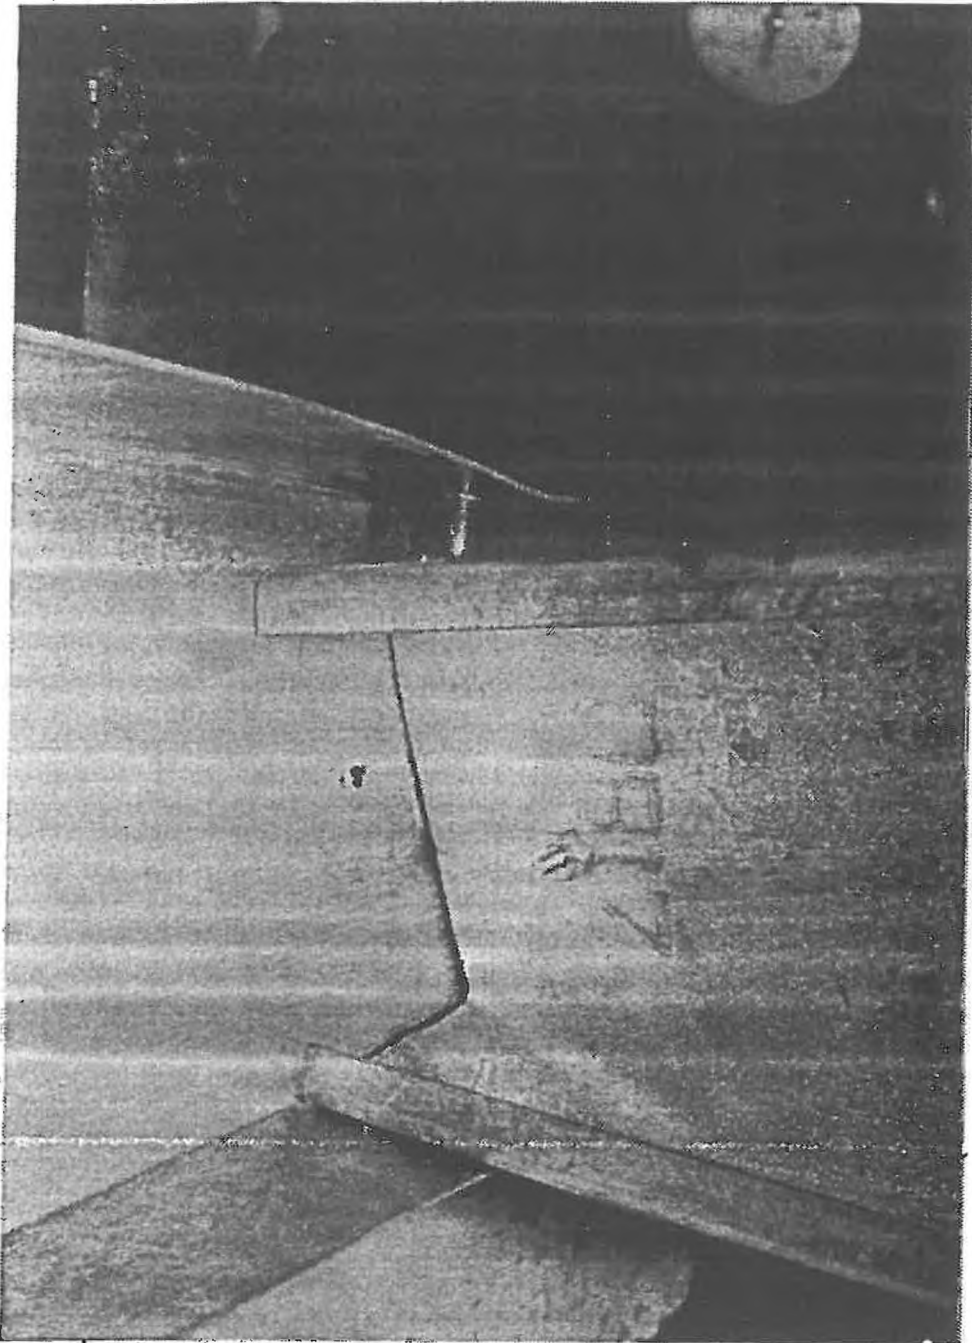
Photograph of Typical Failure for 20 Gauge, 90 mm Deep Specimen - D1
